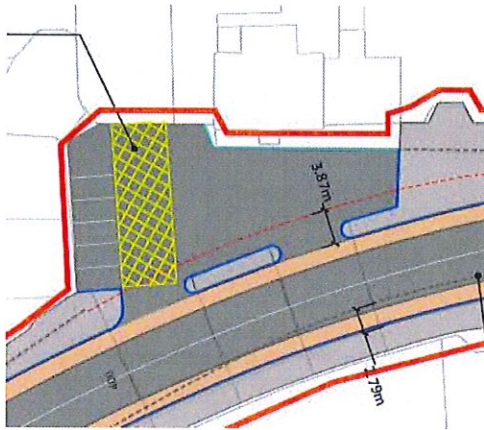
DR-P8-02 Rev PL1, car park at Halls Autospare.
